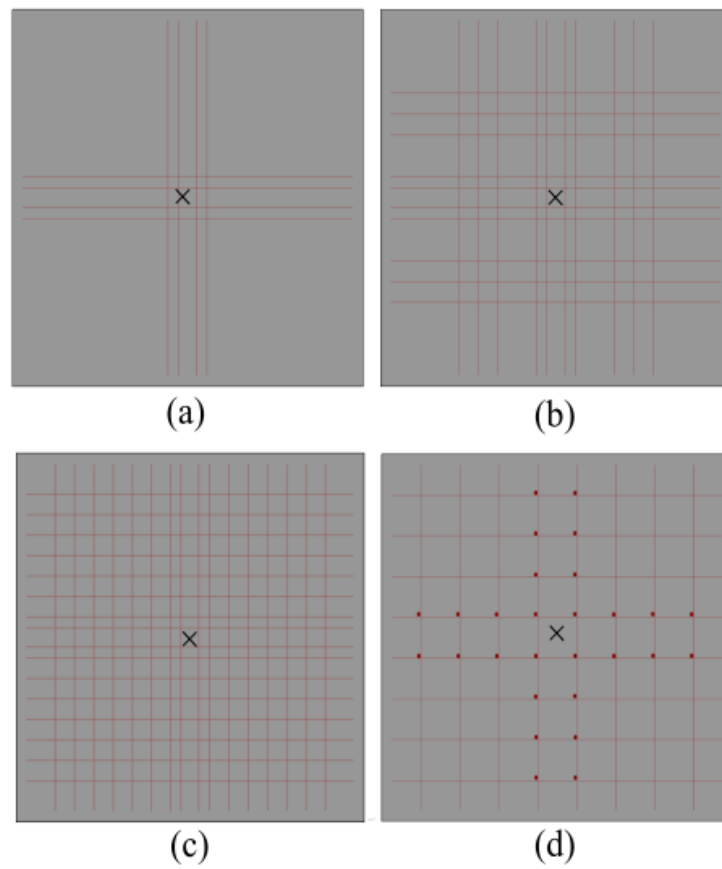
Configurations of longitudinal and transverse reinforcement steels.
